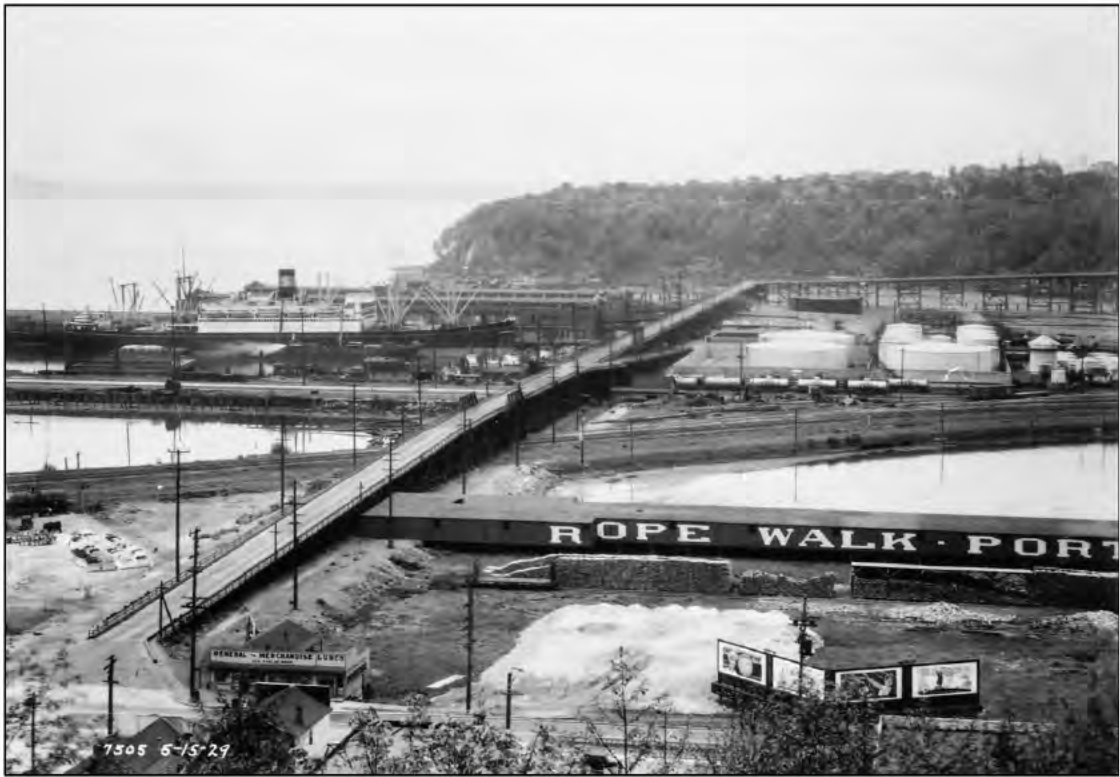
1929 view of Smith Cove, showing early Garfield Street trestle bridge.
